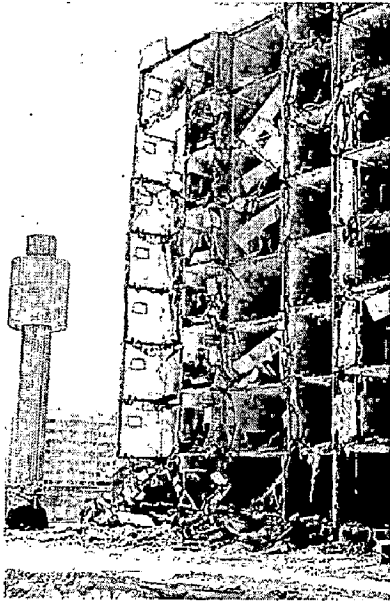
A close up of the precast concrete wall system. Source: The House National Security Committee
